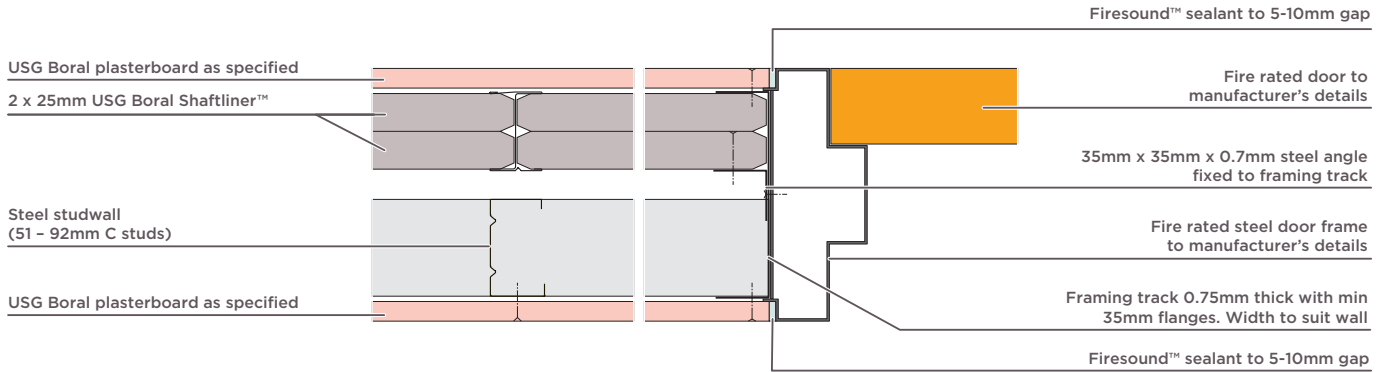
Shaftliner™ Panels to Door Junction Detail 2
